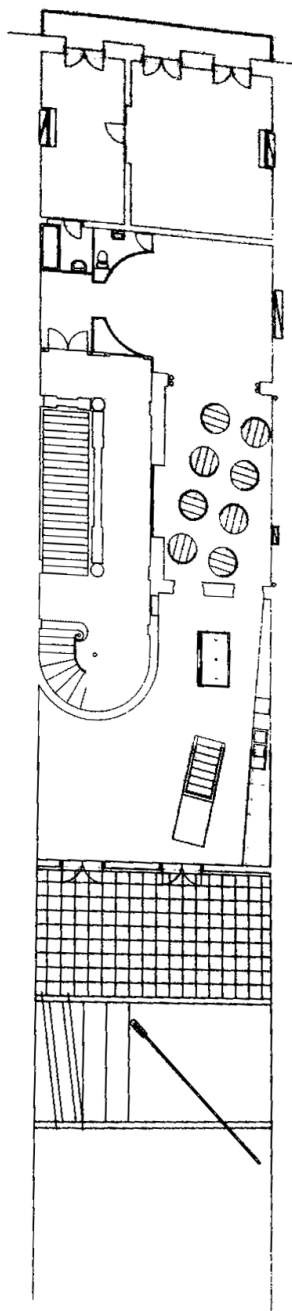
First floor plan of the Cotlenko apartment in Bordeaux. Courtesy the Estate of the Artist and Betts Project.
